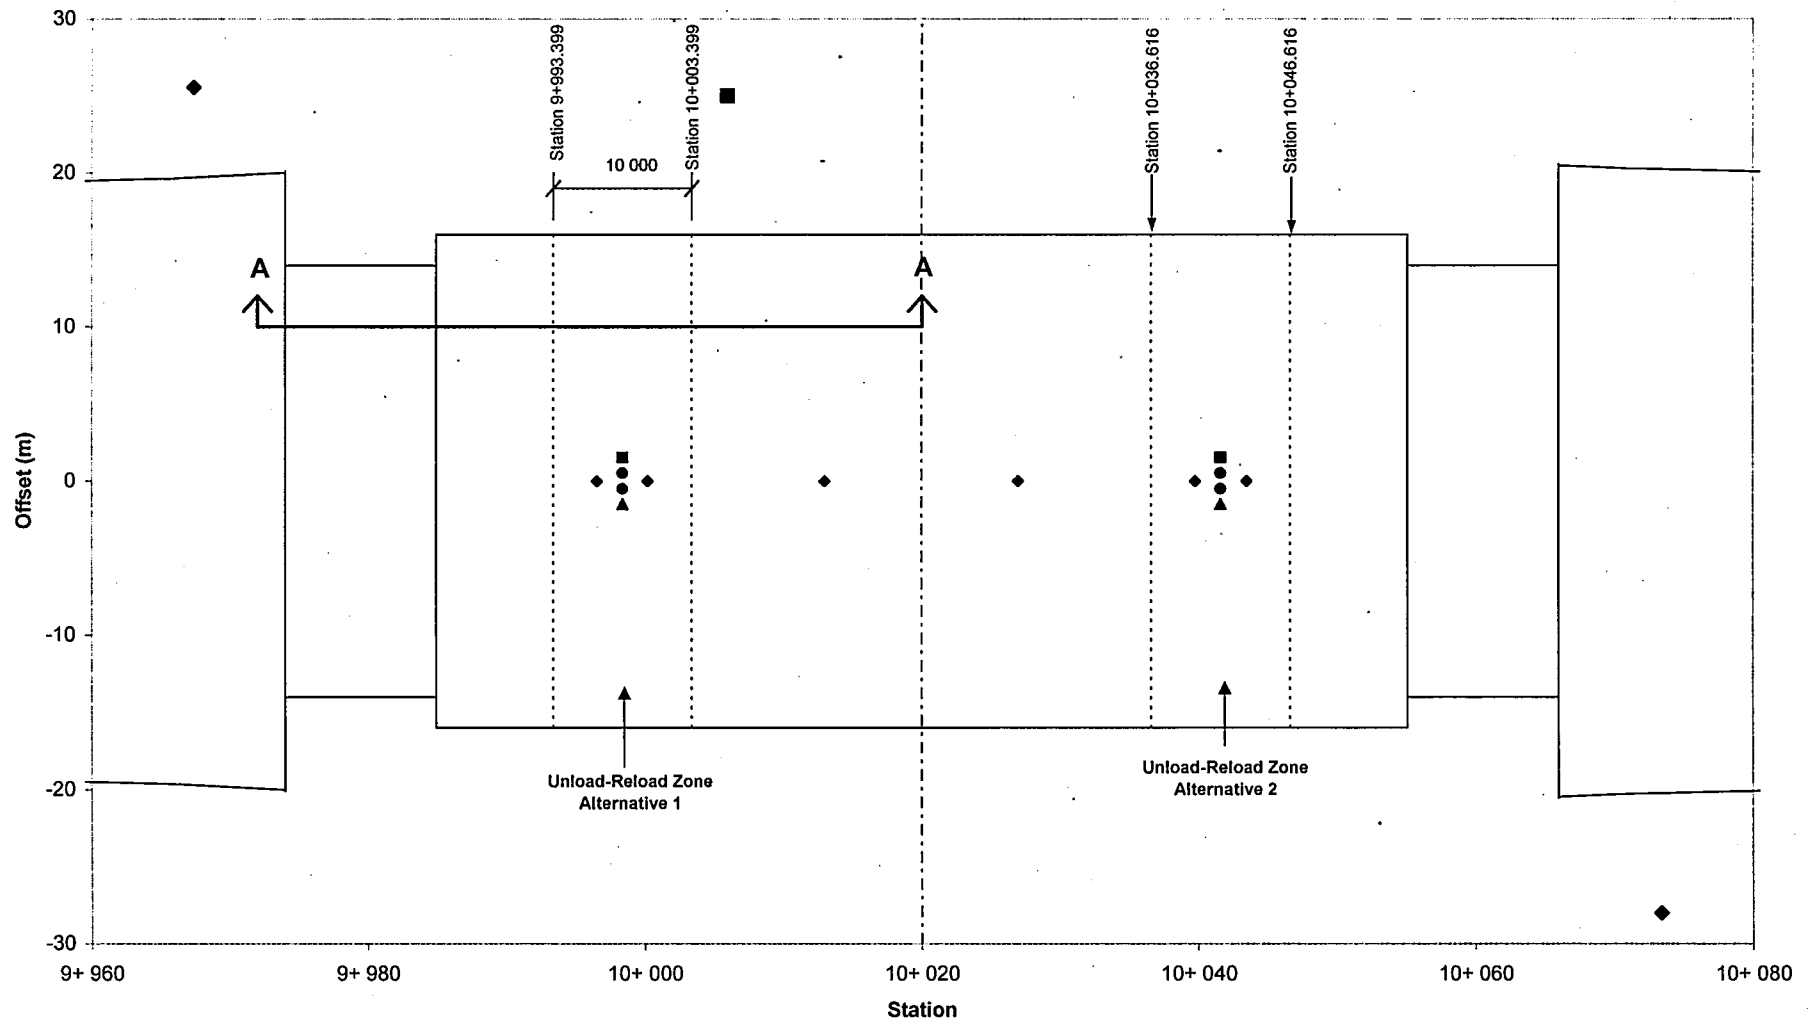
Typical Preload Section, Falsework Foundation, Regional Road 22
